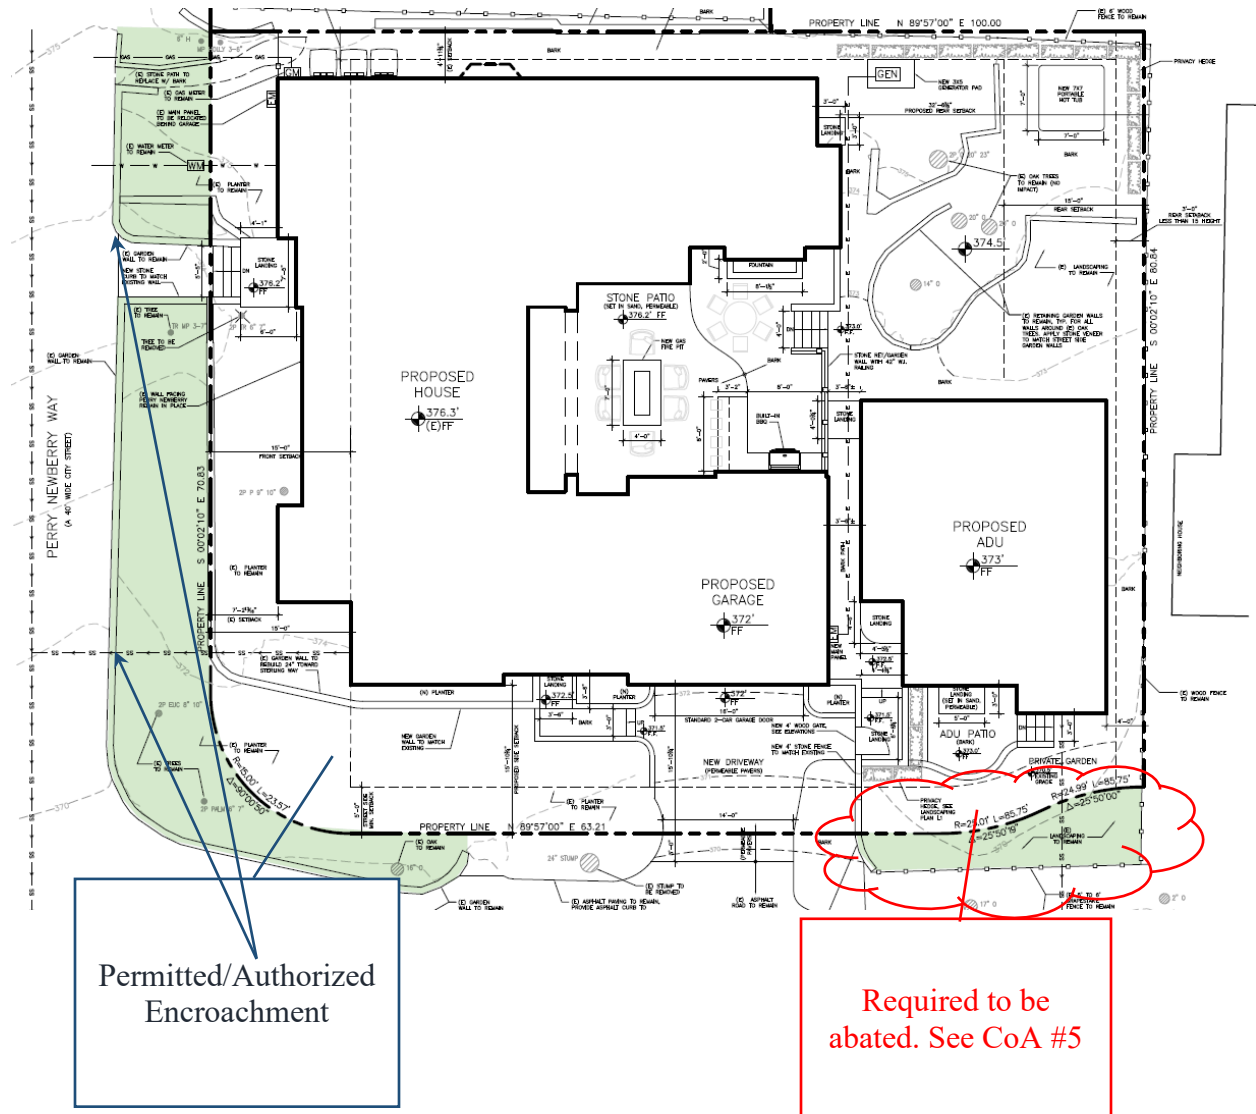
Applicant’s proposed site plan for encroachment permit EN 24-031. Encroachments authorized under this approval include the existing and proposed encroachments in the right-of-way shown on the site plan between Point A and Point B (moving linearly along the property line from north to south, generally). The existing encroachments between Point C and Point D (moving linearly along the property line from west to east, generally) shall be abated in accordance with Condition of Approval #5. No other encroachments are authorized under this approval.
